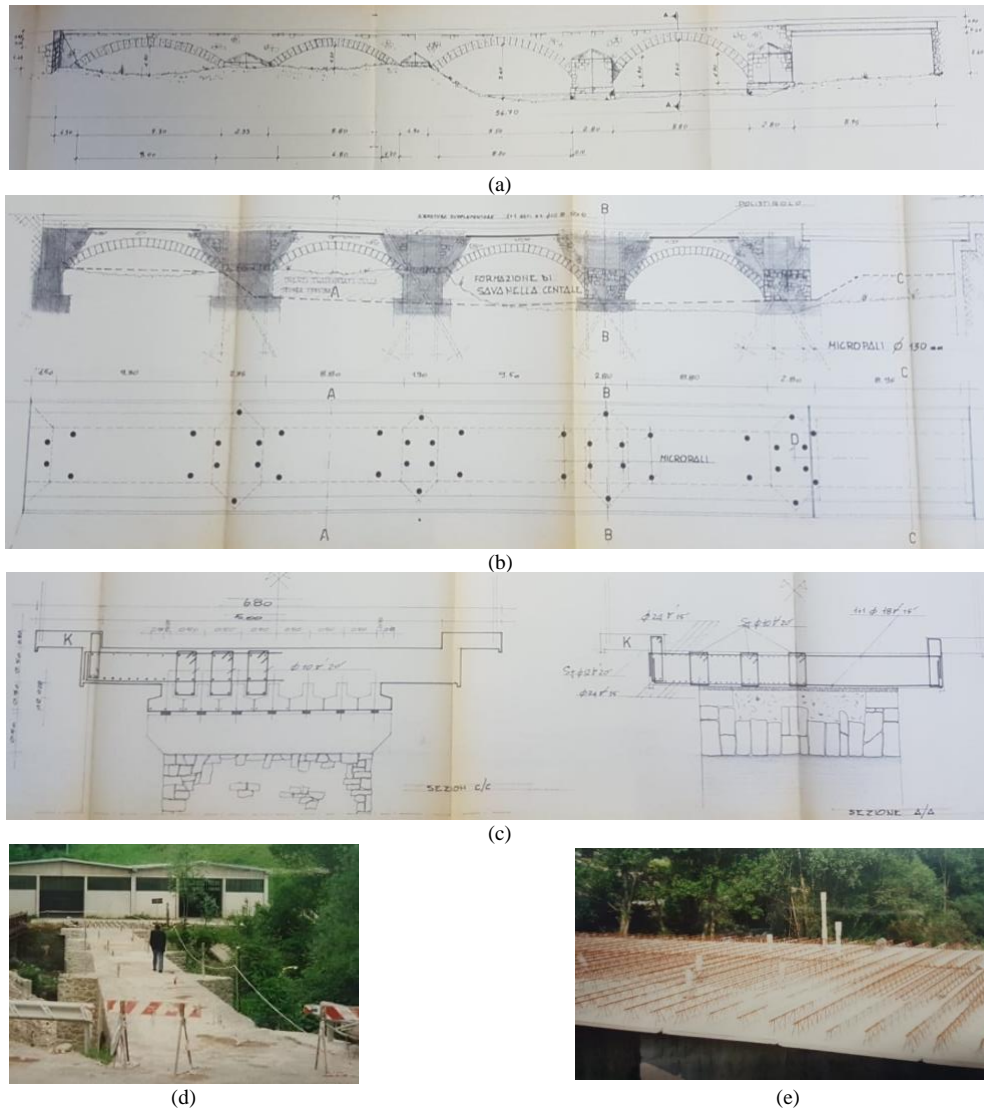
Archival technical drawings from the 1988 intervention, courtesy of the Archival of the Technical Office of Pistoia: (a) elevation view pre-intervention, (b) elevation view post-intervention, (c) carpentry of the transversal sections, (d) micro piles intervention on the piers, (e) precast concrete deck before the final concrete cast.
